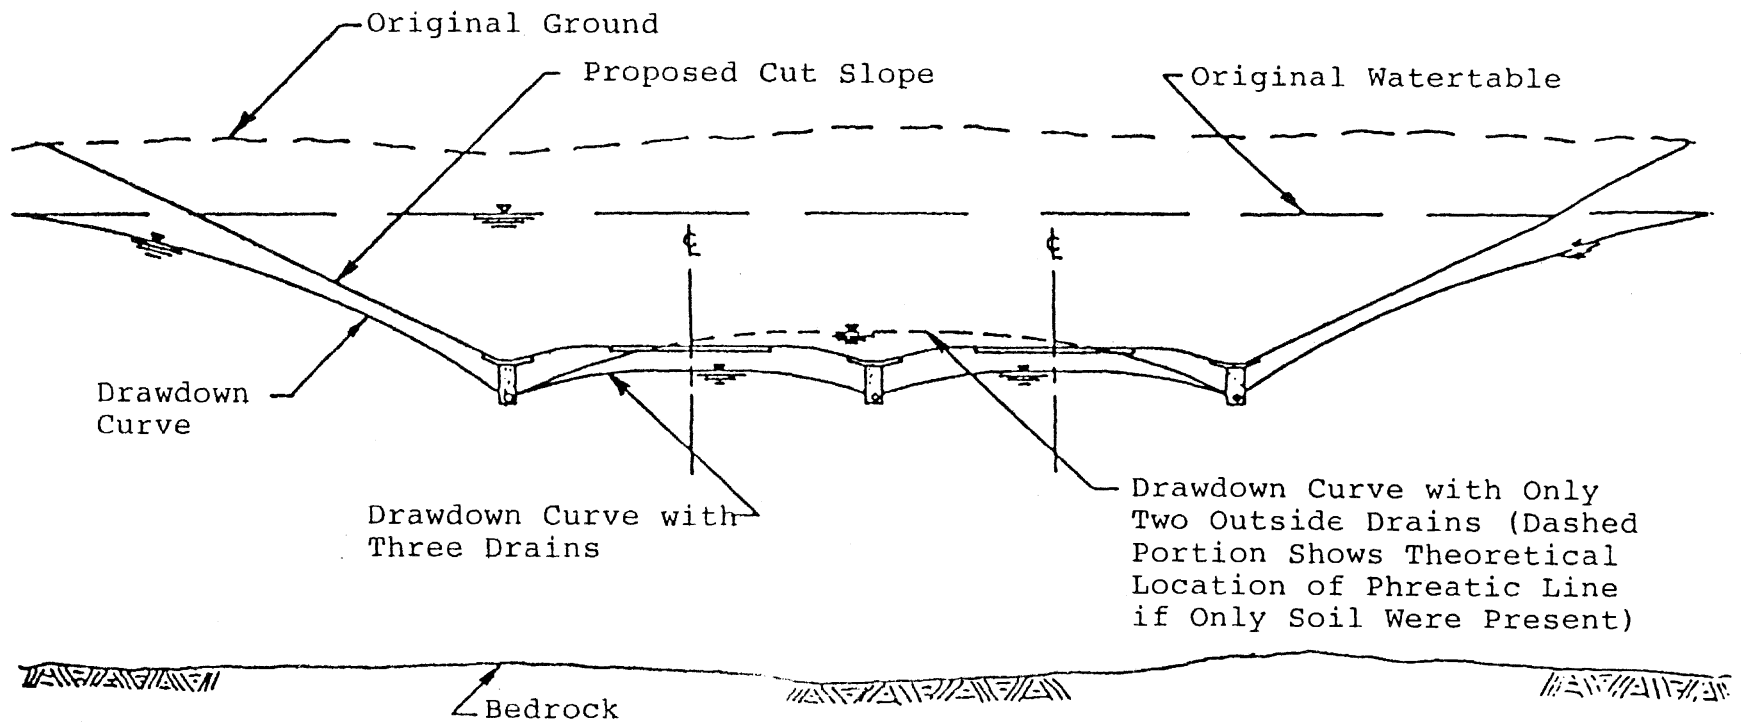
Multiple Longitudinal Drawdown Drain Installation.
